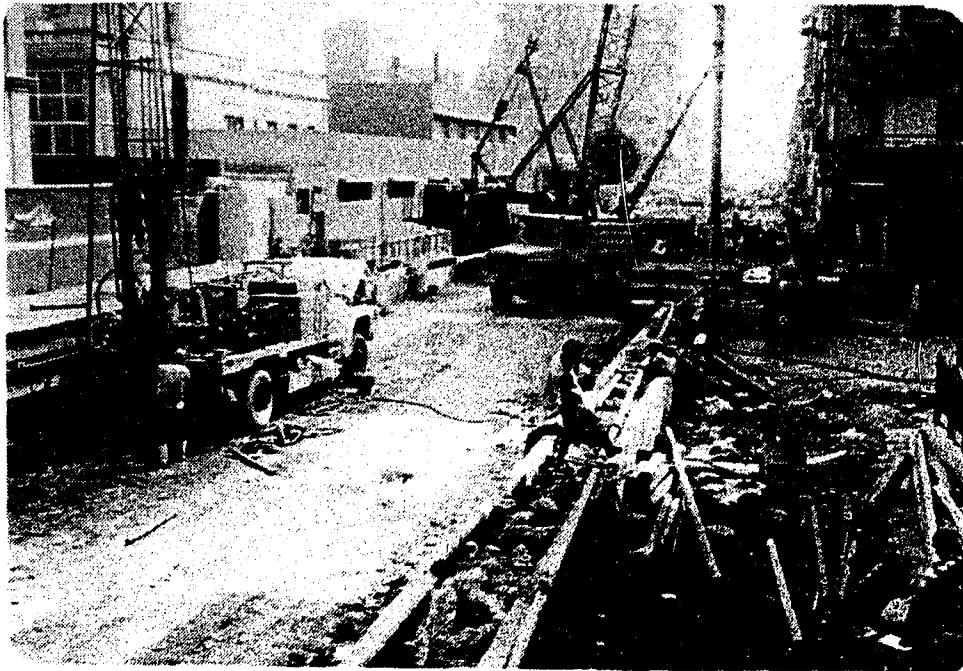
Longitudinal View of the Excavation Procedure Steps for the Running Tunnel Test
